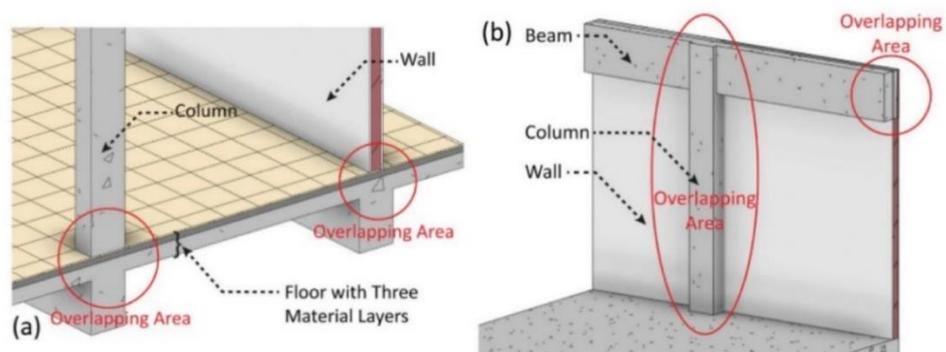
(a) Composite floor and (b) wall elements overlapping with other building components Khosakitchalert et al. (2019a)
